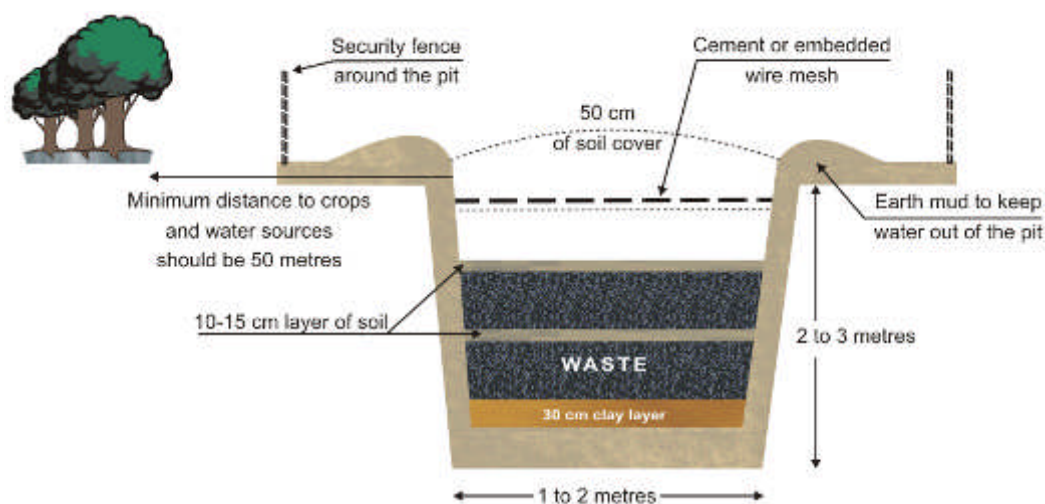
Recommended design for a medical waste pit as interim disposal solution
